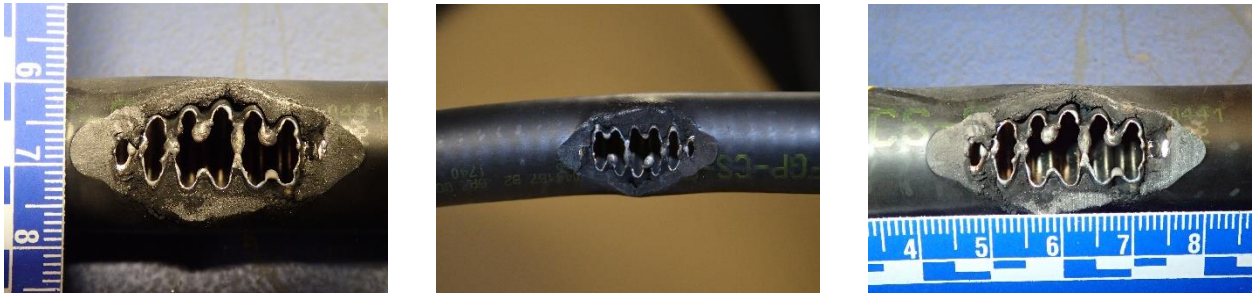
Damage to CounterStrike® CSST in test 3.1.
